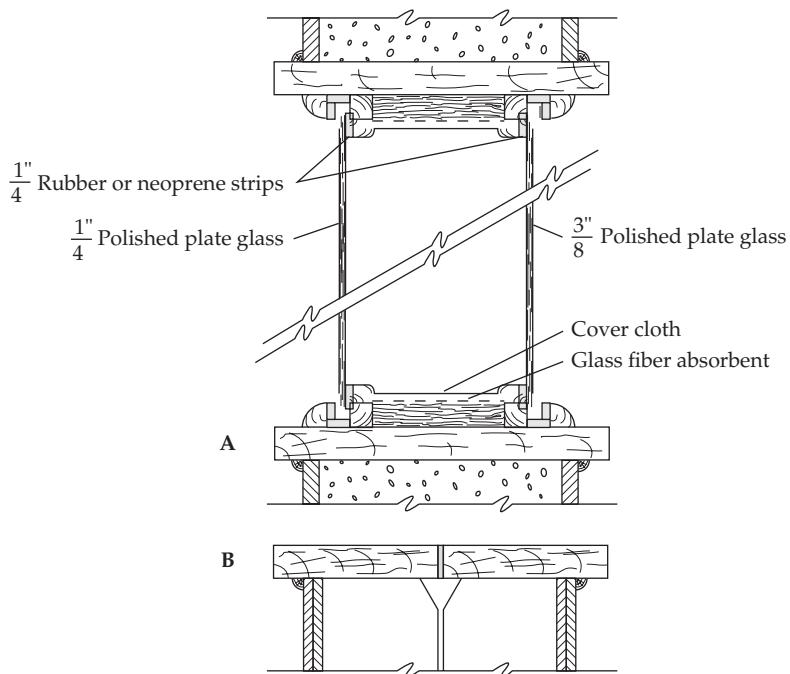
Wall construction with double-pane window. (A) For concrete-block walls. (B) For staggered-stud walls.
